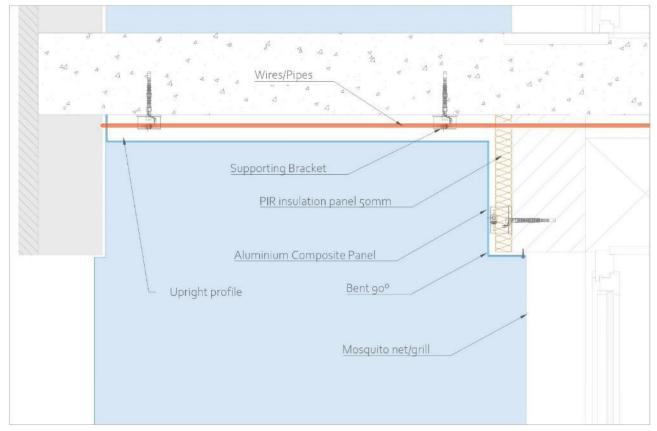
Balcony detail (Vertical) [drawing created using AutoCAD]
